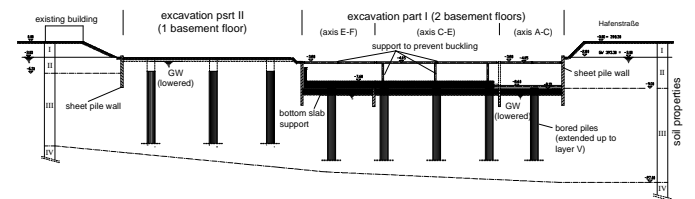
Section at MQ 1 from west to east, with excavation part I in progress
